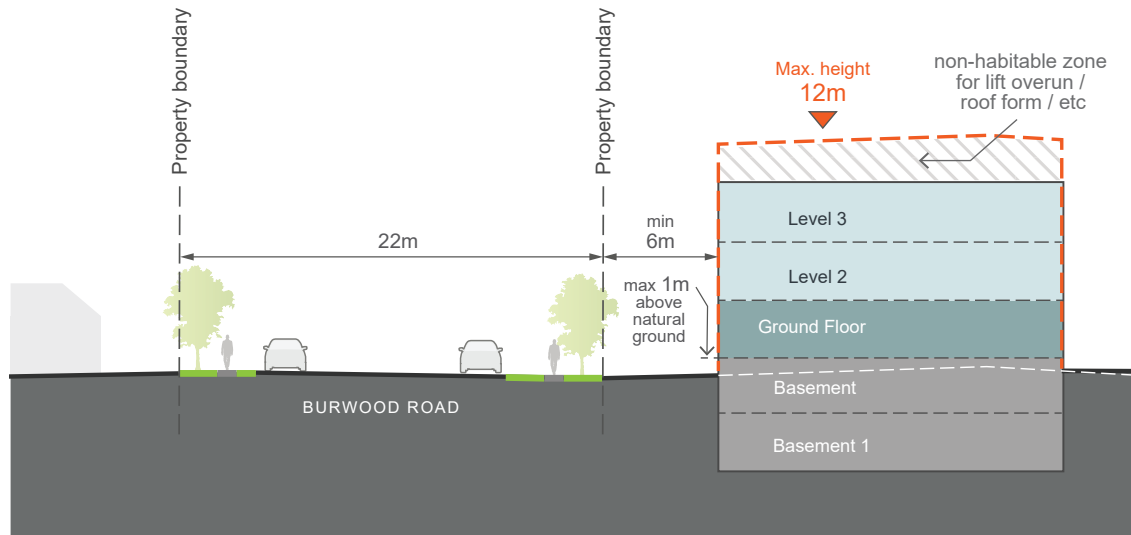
Section 1: Burwood Road and 3 storey terrace interface
